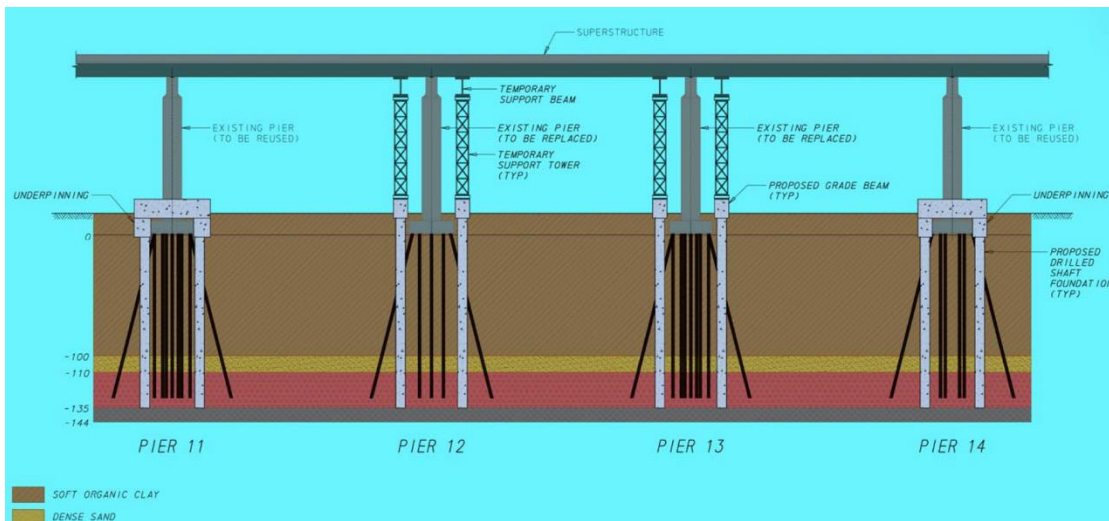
Pier 12 and 13 Temporary Support Towers & Support Beams (Source: DeIDOT Personnel, with permission)
